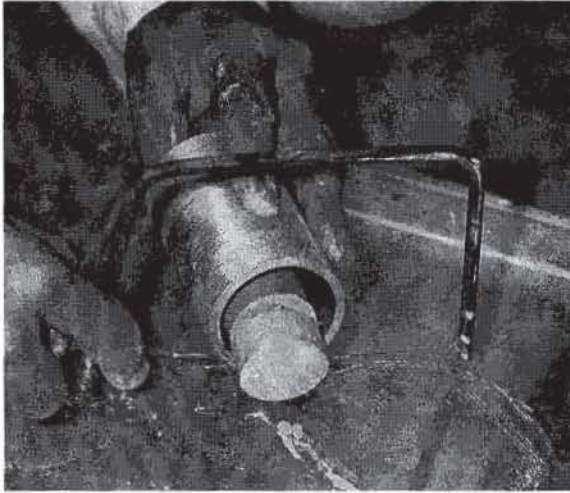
The top and bottom surfaces are cut perpendicular to the specimen axis using a wire saw.
